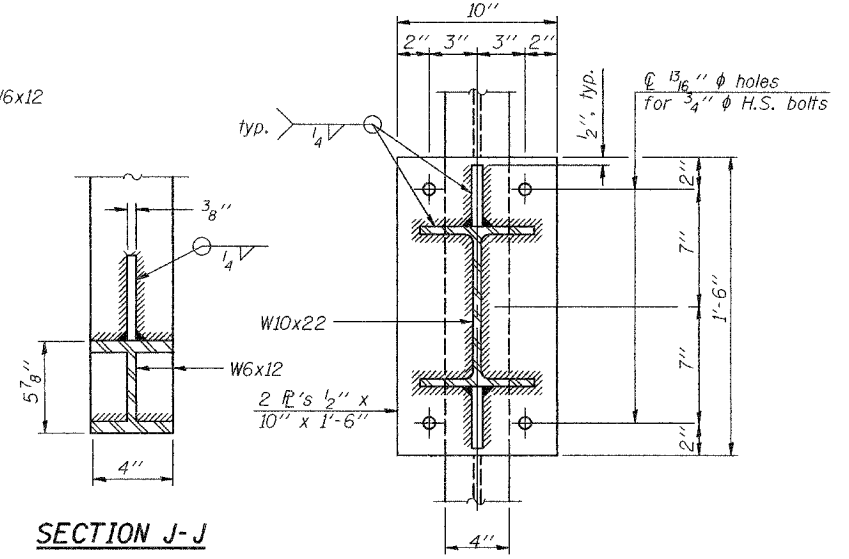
DETAIL B - ALTERNATE BOLTED W10x22 TO W6x12 CONNECTION
